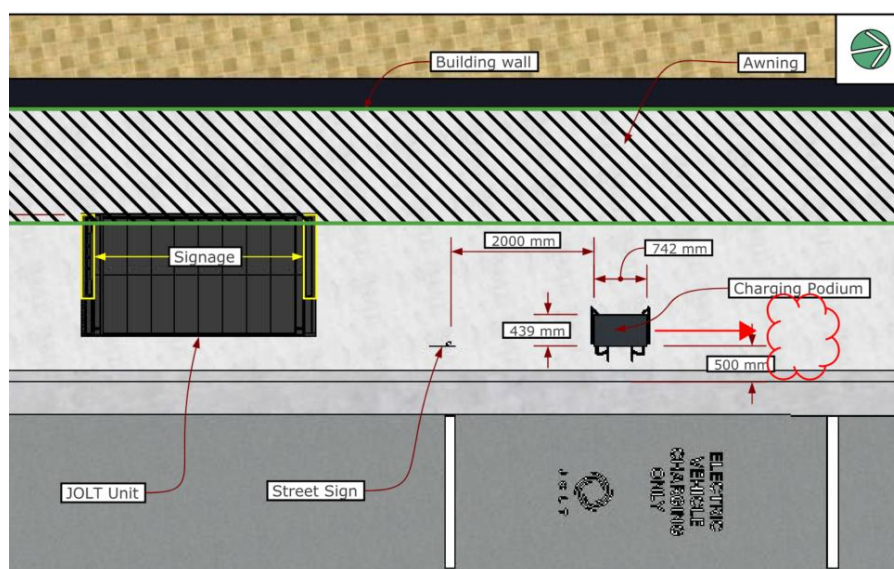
Proposed plan showing the indicative relocation of the podium in red, subject to further plans from the applicant (Source: Jolt Charge)
